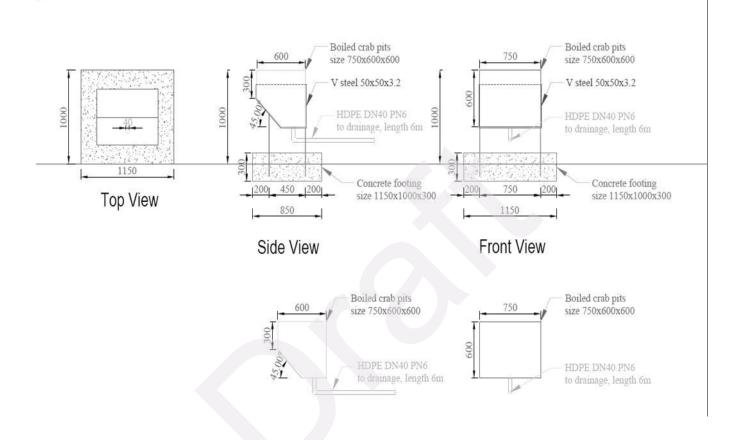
Sketch plan at scale of the collection sink for the used water for boiling crab
